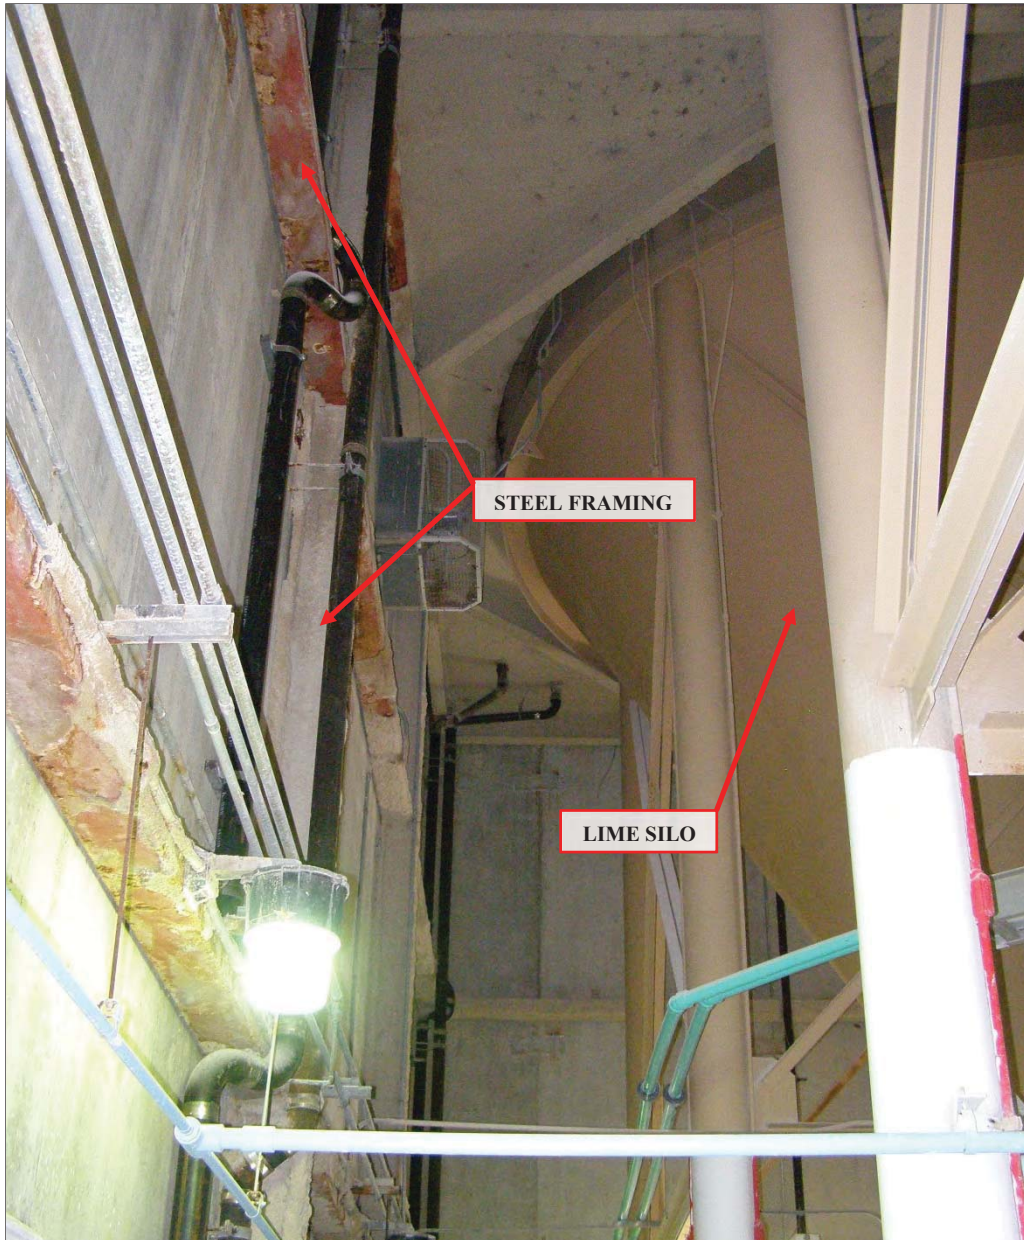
Steel Framing with Corrosion and Loss of Fire Protection
